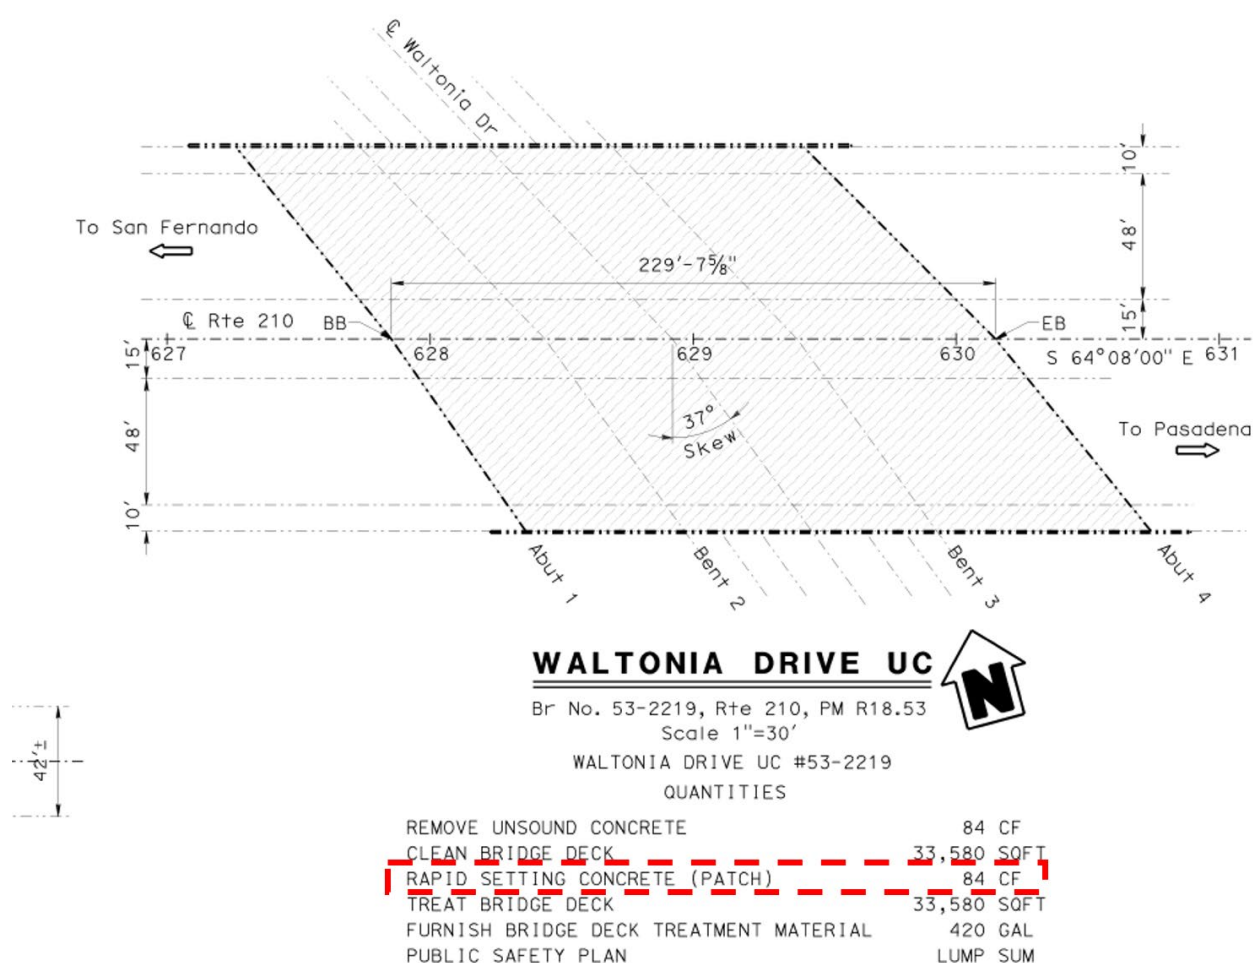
Bridge Plan Sheet with Anticipated Spall Repair Quantity
